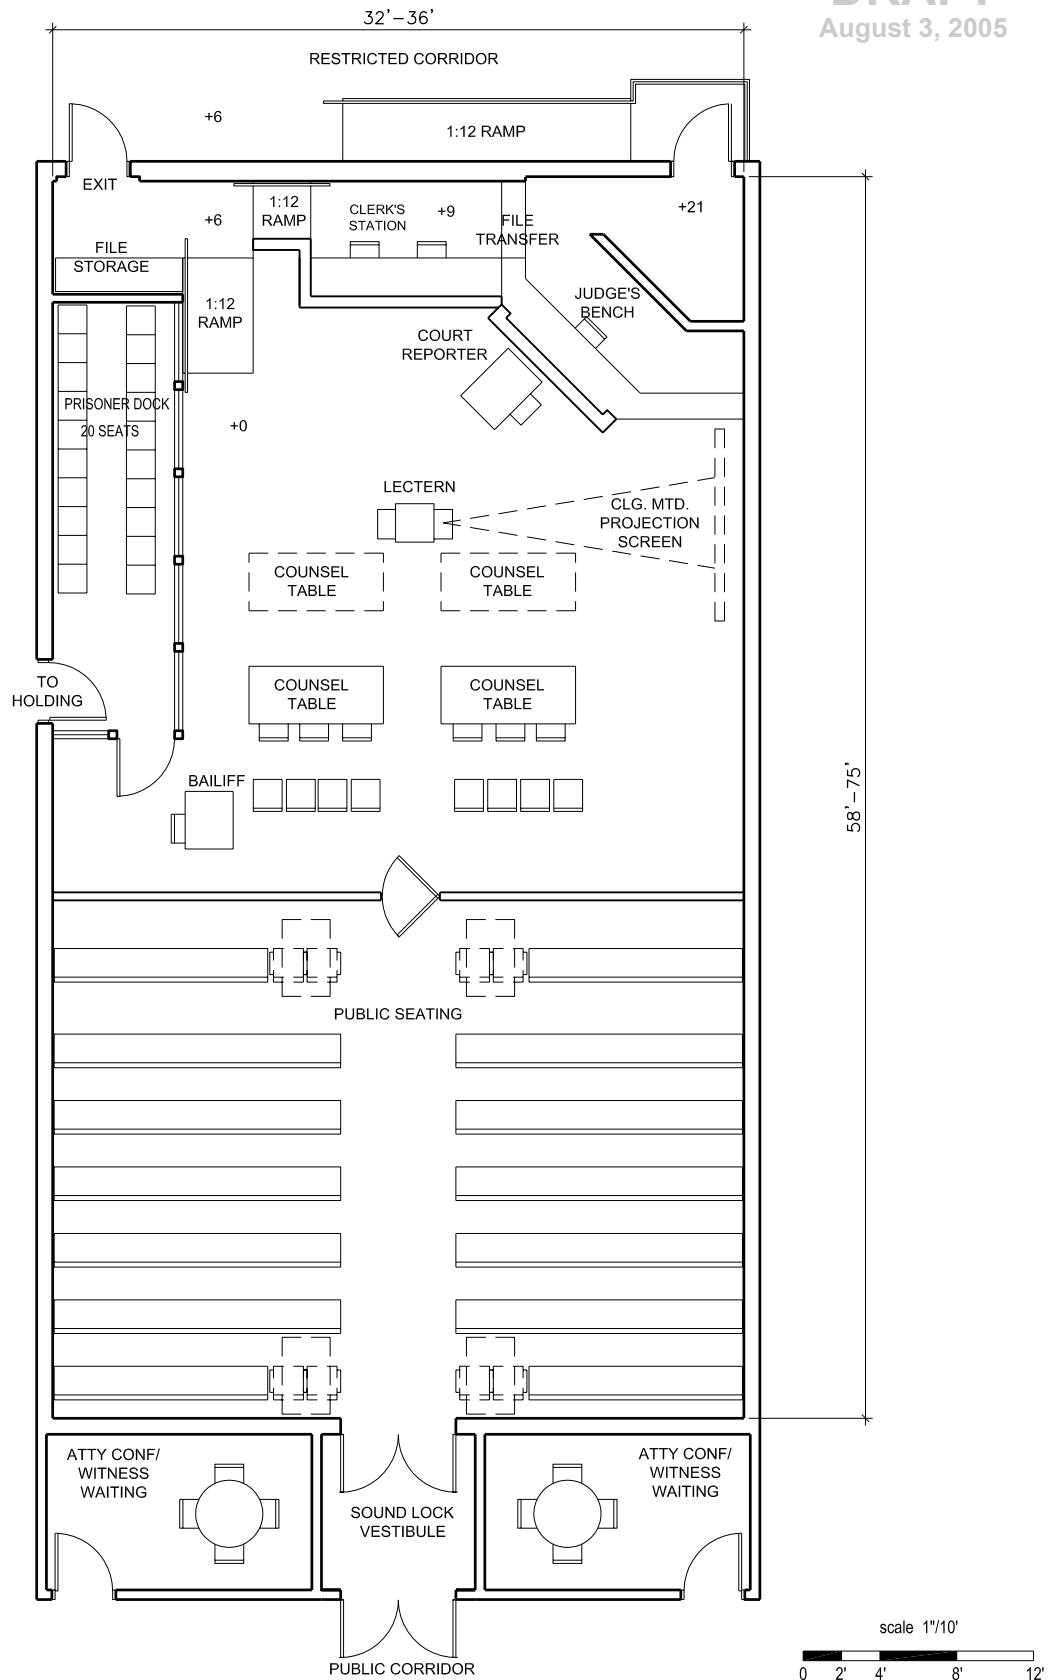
Arraignment Courtroom (36' bay, Corner Bench)
